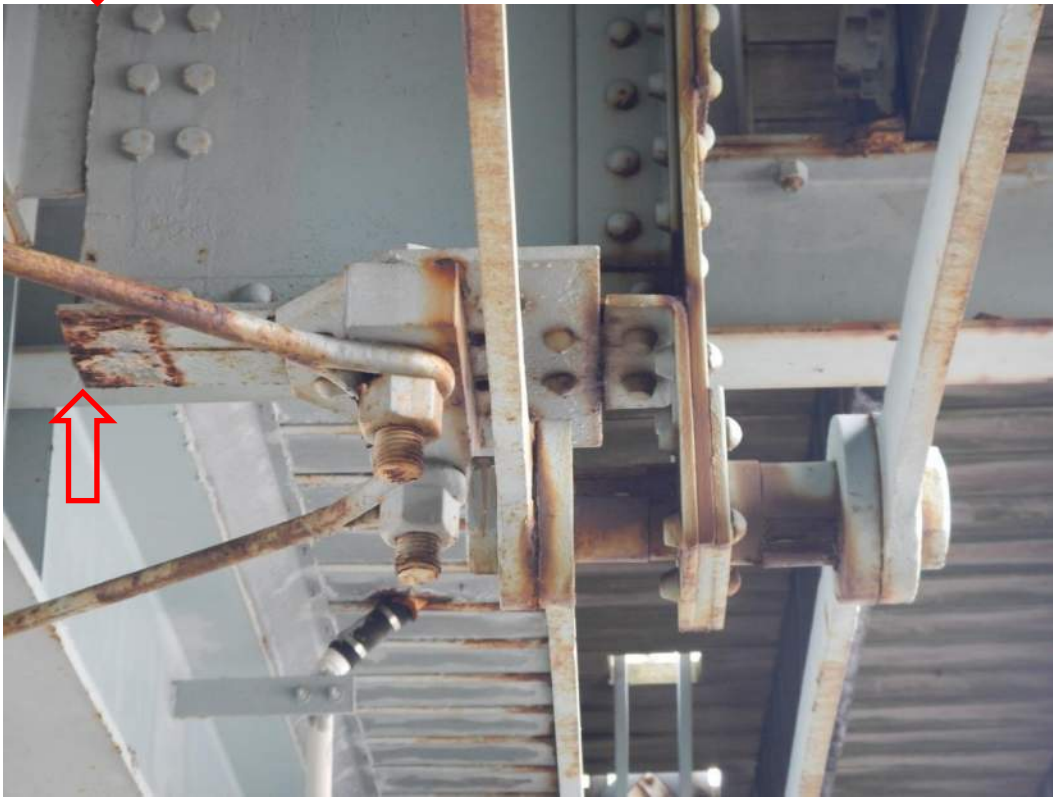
Attachment point of the original truss to the new steel superstructure. All but the outer 18-24" of the floor beams were removed and then bolted to the new superstructure beams (red arrows indicate the cut line).
